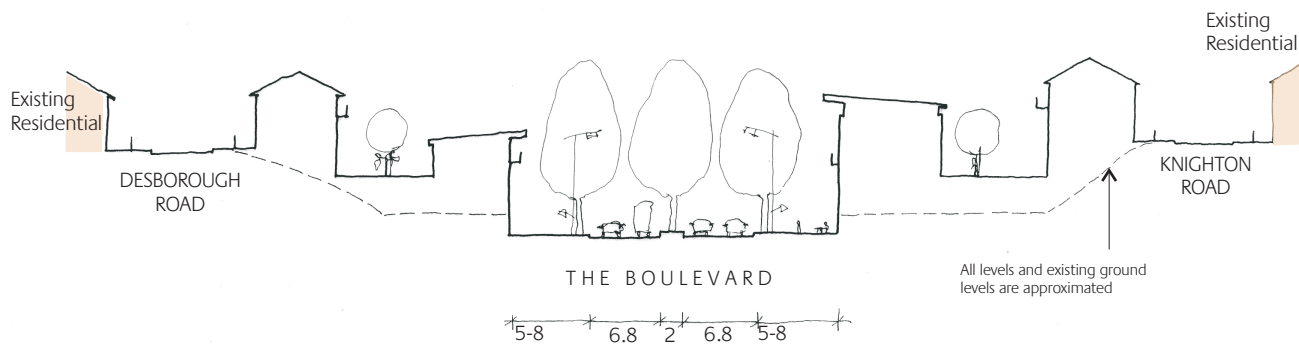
The Boulevard Indicative Section Area C, showing development facing the boulevard and integrated into surrounding areas
